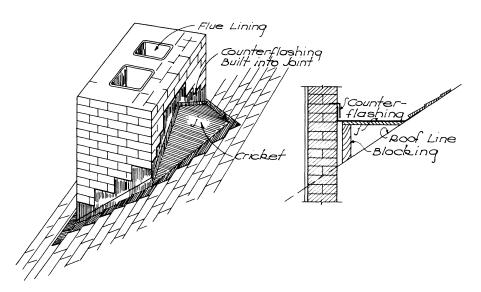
Construction of a cricket (j, fig. 9) behind a chimney.
